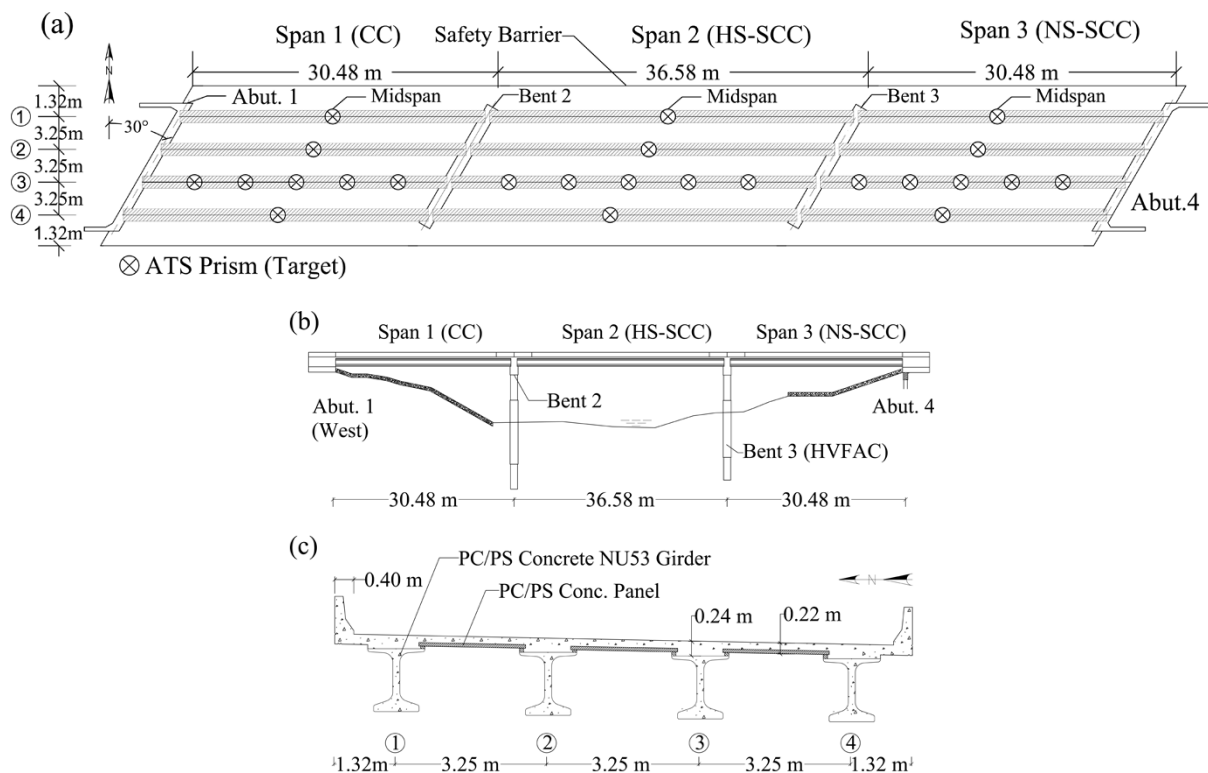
Bridge A7957: (a) Plan view and ATS target (prism) locations; (b) elevation; (c) cross section. Conversion factor: 1 m = 3.28 ft.
